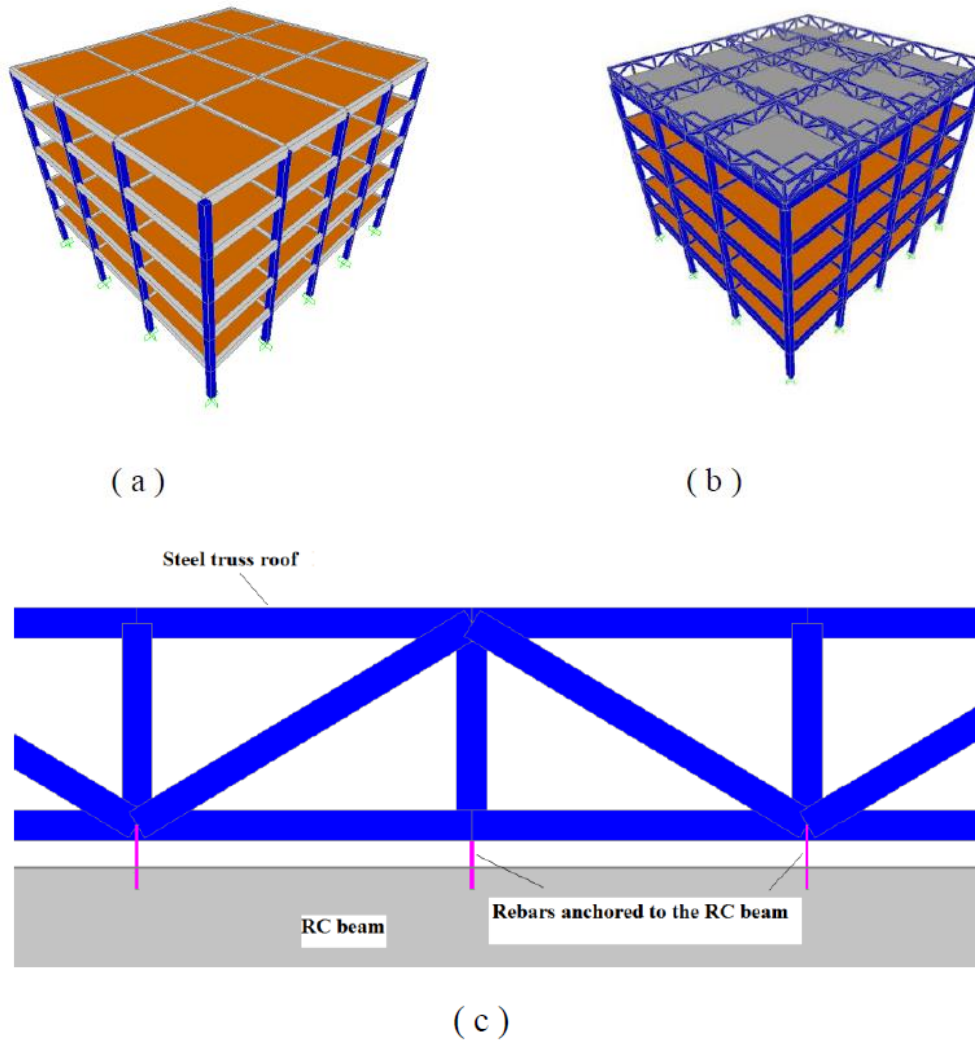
a) FEM Model, b) Model with TMD Steel Roof, c) Roof-building Connection Details
